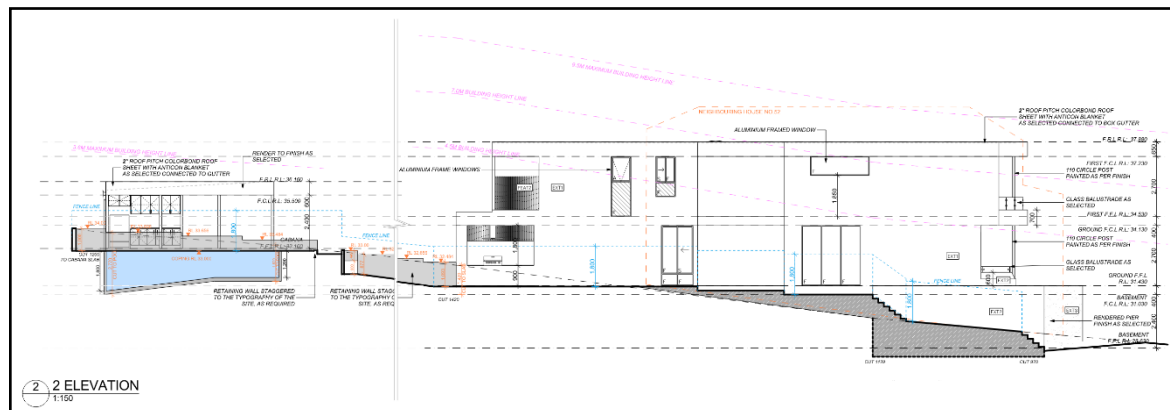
Western Elevation - 54 Daunt Avenue: (Source: Prime Design Studios)
